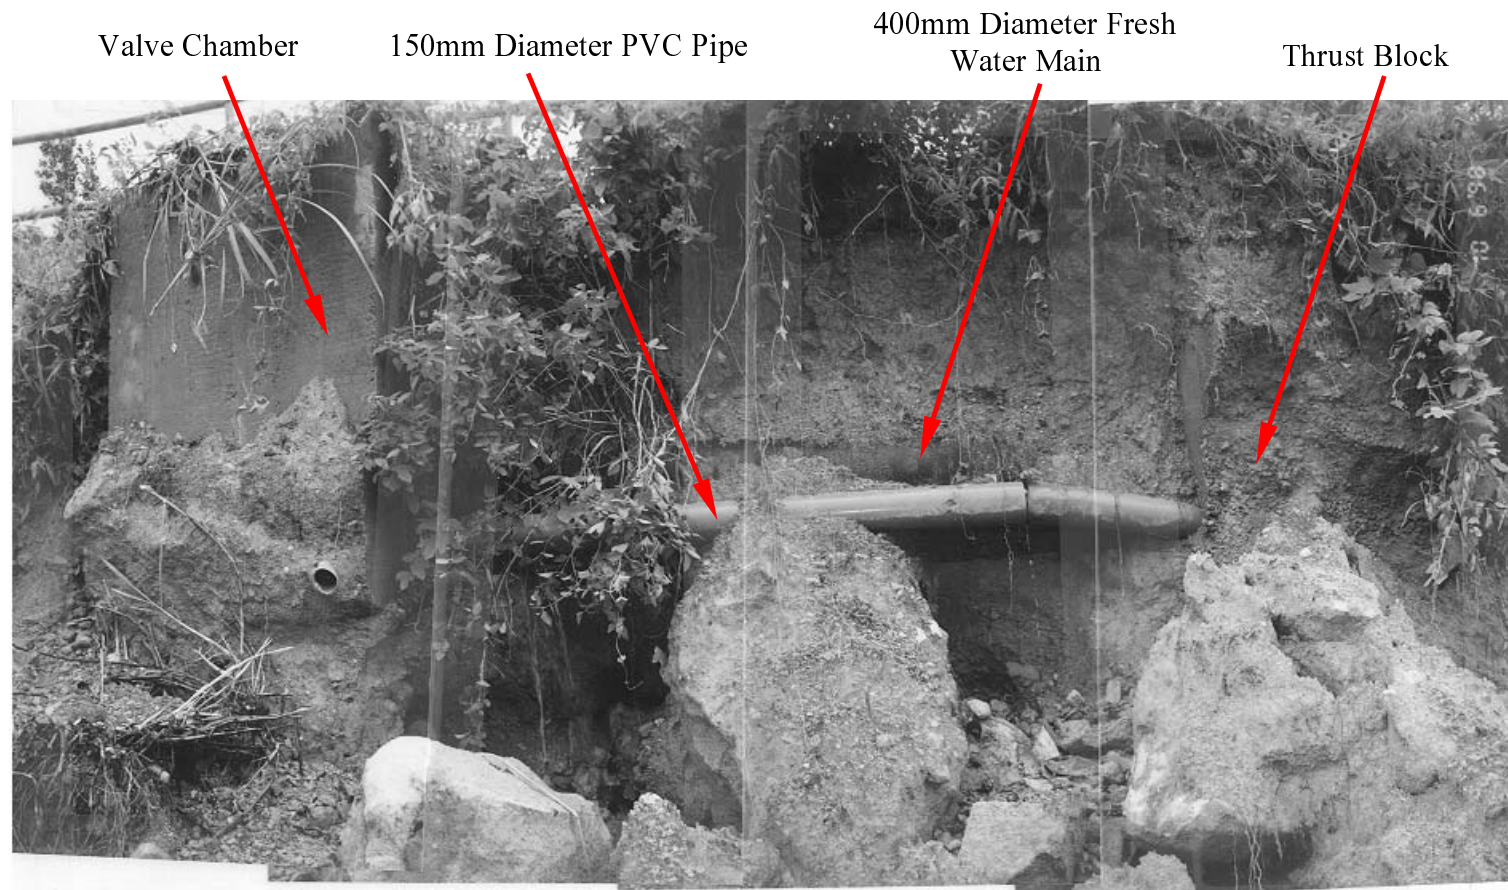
View of Pipework Exposed in Main Scarp of Landslide Indicating Valve Chamber on Left of Frame, 400 mm Diameter Water Main and 150 mm Diameter PVC Pipe in Centre of Frame and Mass Concrete Structure on Right of Frame. Note Open Butt Joints in PVC Pipe (Water Still Flowing From Pipe) and Heavy Gully Erosion in Scarp Below. (Photograph Taken on 10 June 1998)
